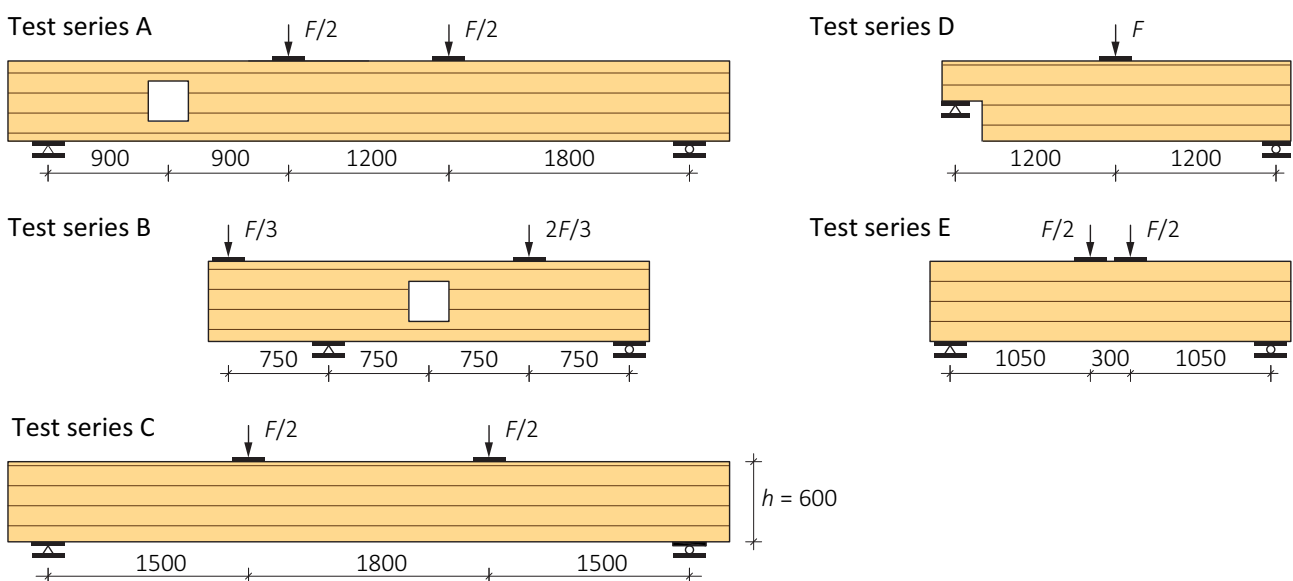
Overview of test series for in-plane loaded CLT beams, dimensions in mm.
